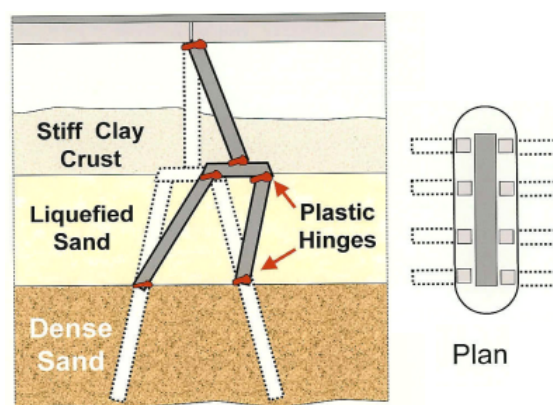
Assumed “ failure ” mechanism of the Pier C of the Landing Road Bridge (after Berrill et al. [8]), original from Giannakou [9]
